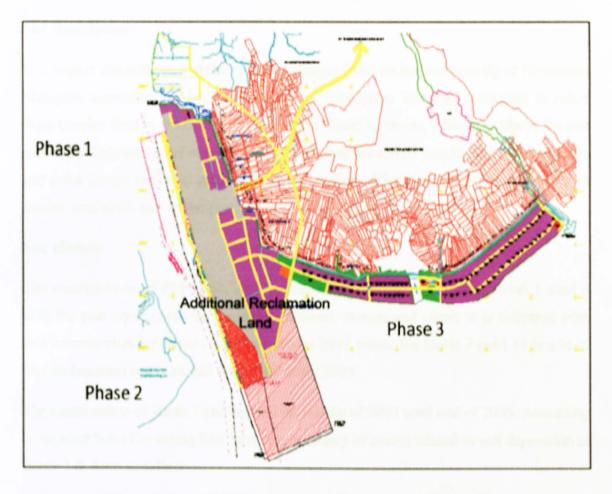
General PTP Layout Plan (Source: PTP Master Plan)
